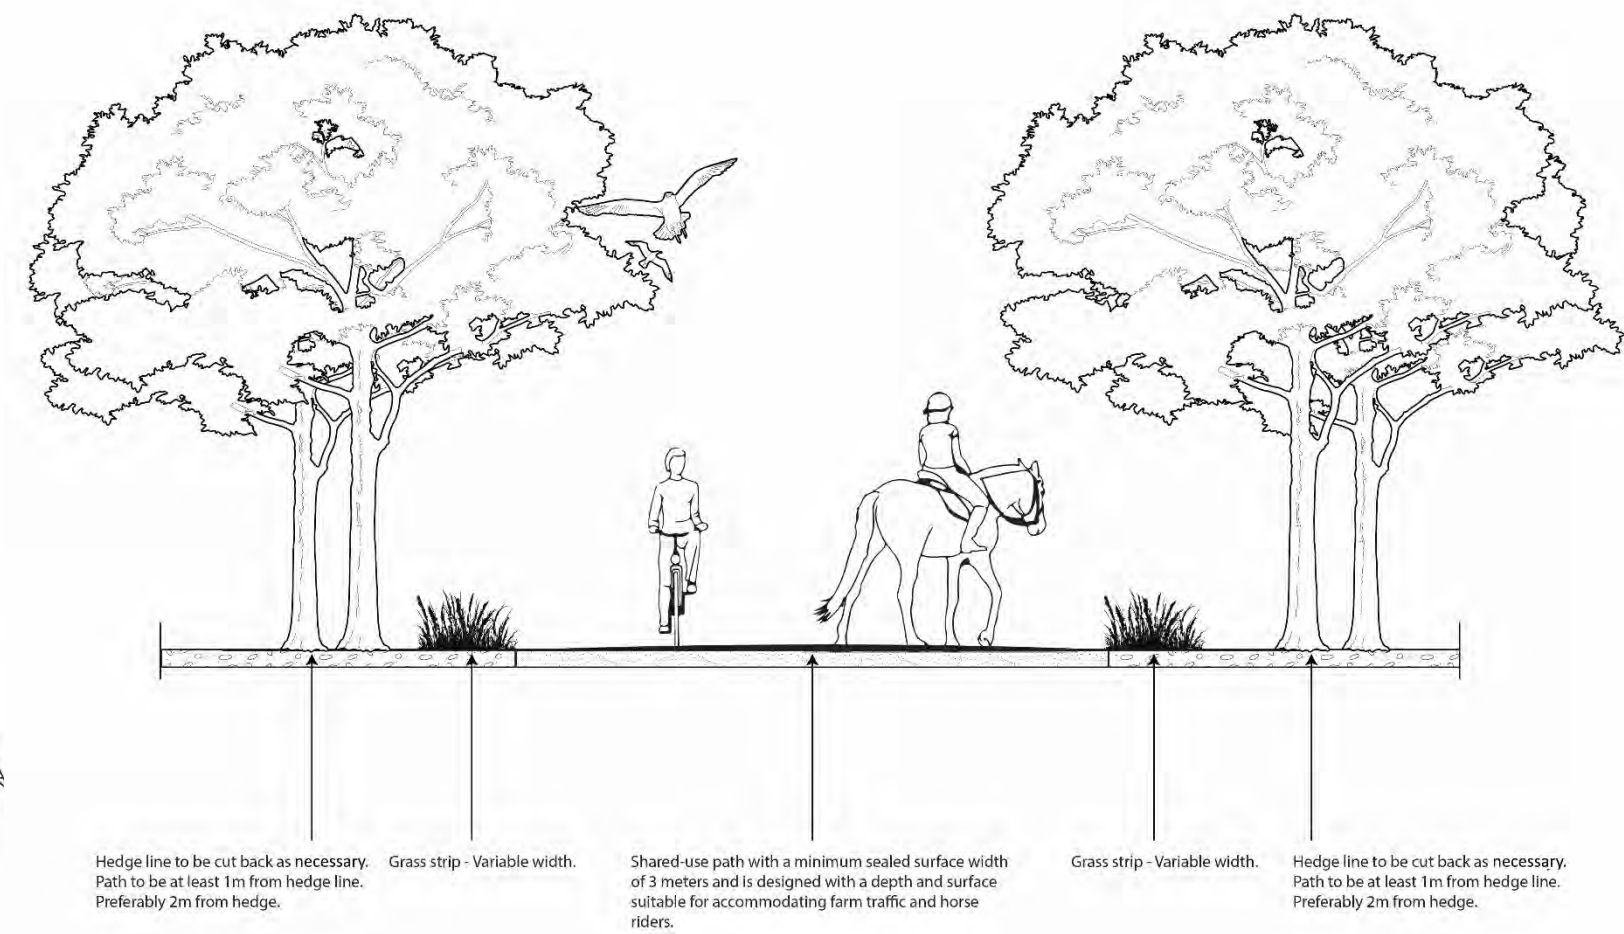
A.5.2 Cross Section showing the potential arrangement for narrower byways.
